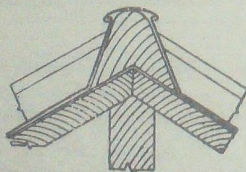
Wooden ridge roll used with sheet metal roofing.
